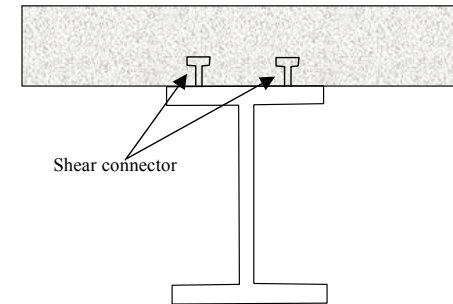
(a): Cross-section of Steel Beam with Top Flange Connected to Concrete Slab
